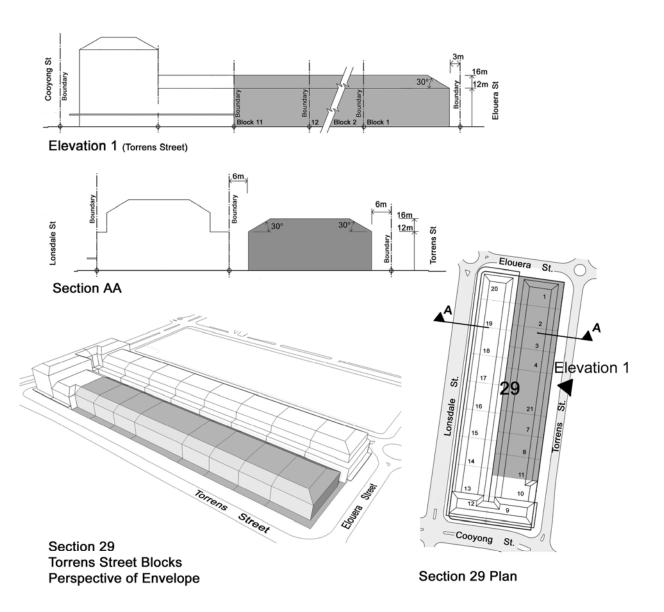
Building Envelope Diagram - Braddon Section 29 Blocks 1– 4, 7,8, 10, 11and 21 (CZ2 Zone)
